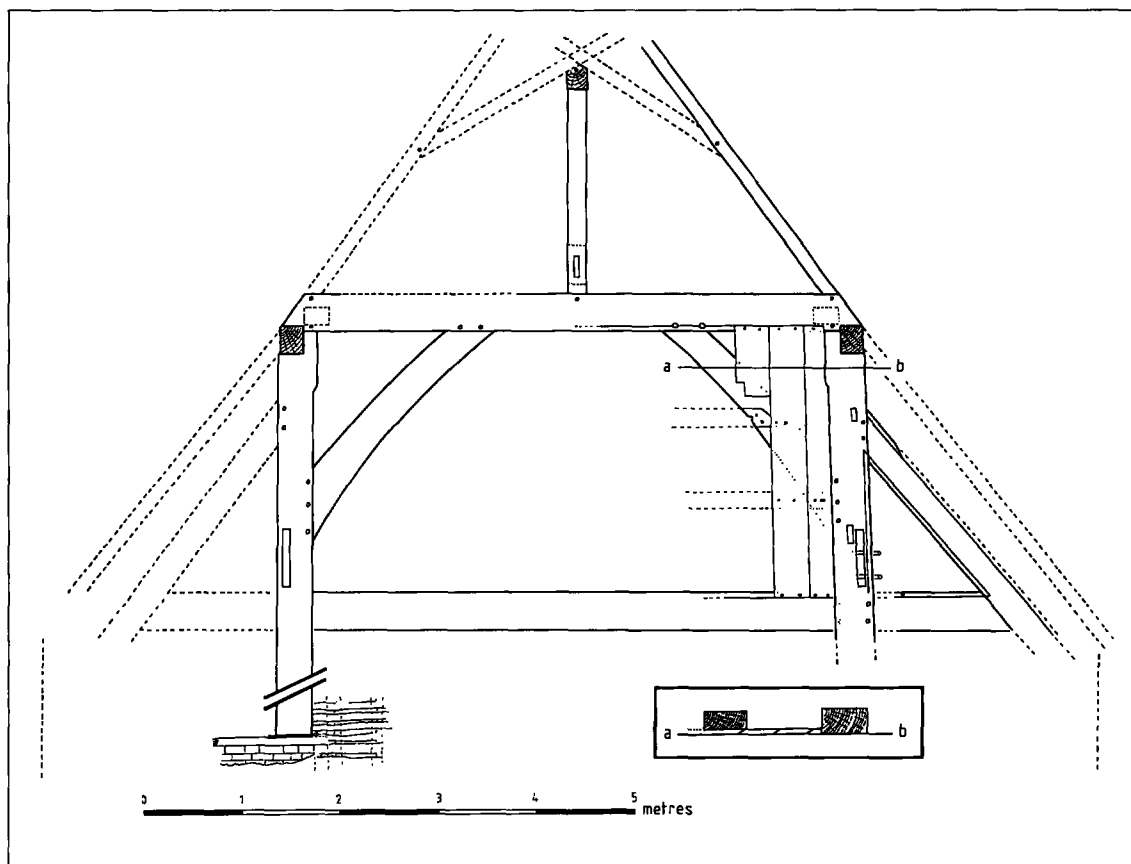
House adjoining Pilgrims' Hall, Winchester. Closed truss I viewed from south. Solid lines indicate surviving timberwork.
